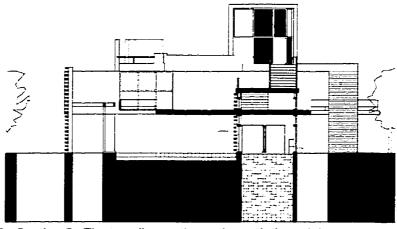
Section 5. The traveller continues the path through heavy wooden doors.
